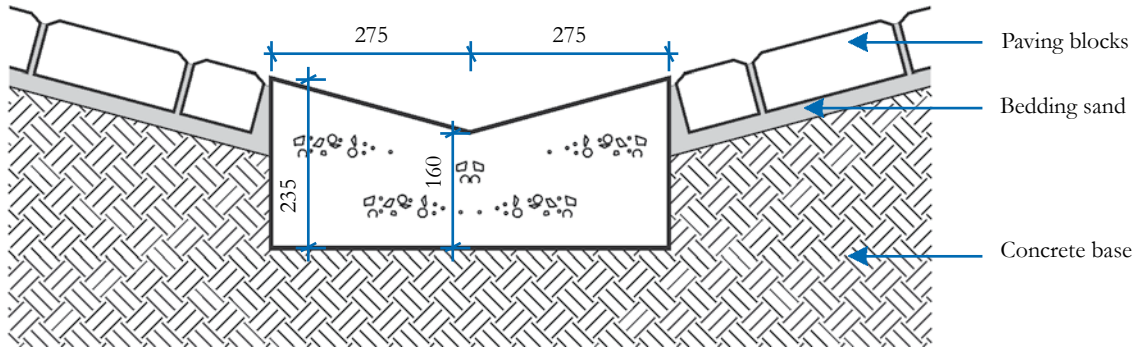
DETAIL OF DRAINAGE TO BEDDING SAND LAYER — DETAIL B
